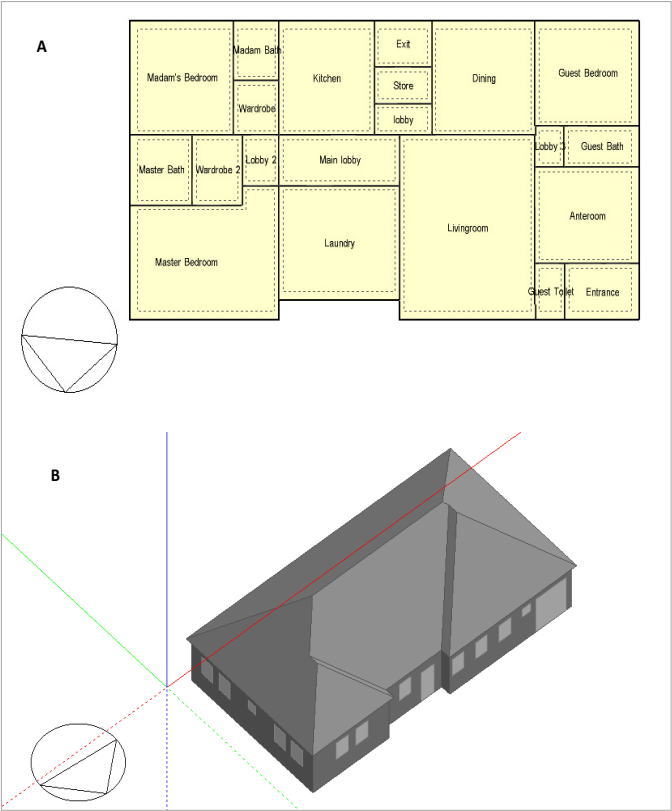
DesignBuilder floor plan (A) and 3D model (B) of the case building
